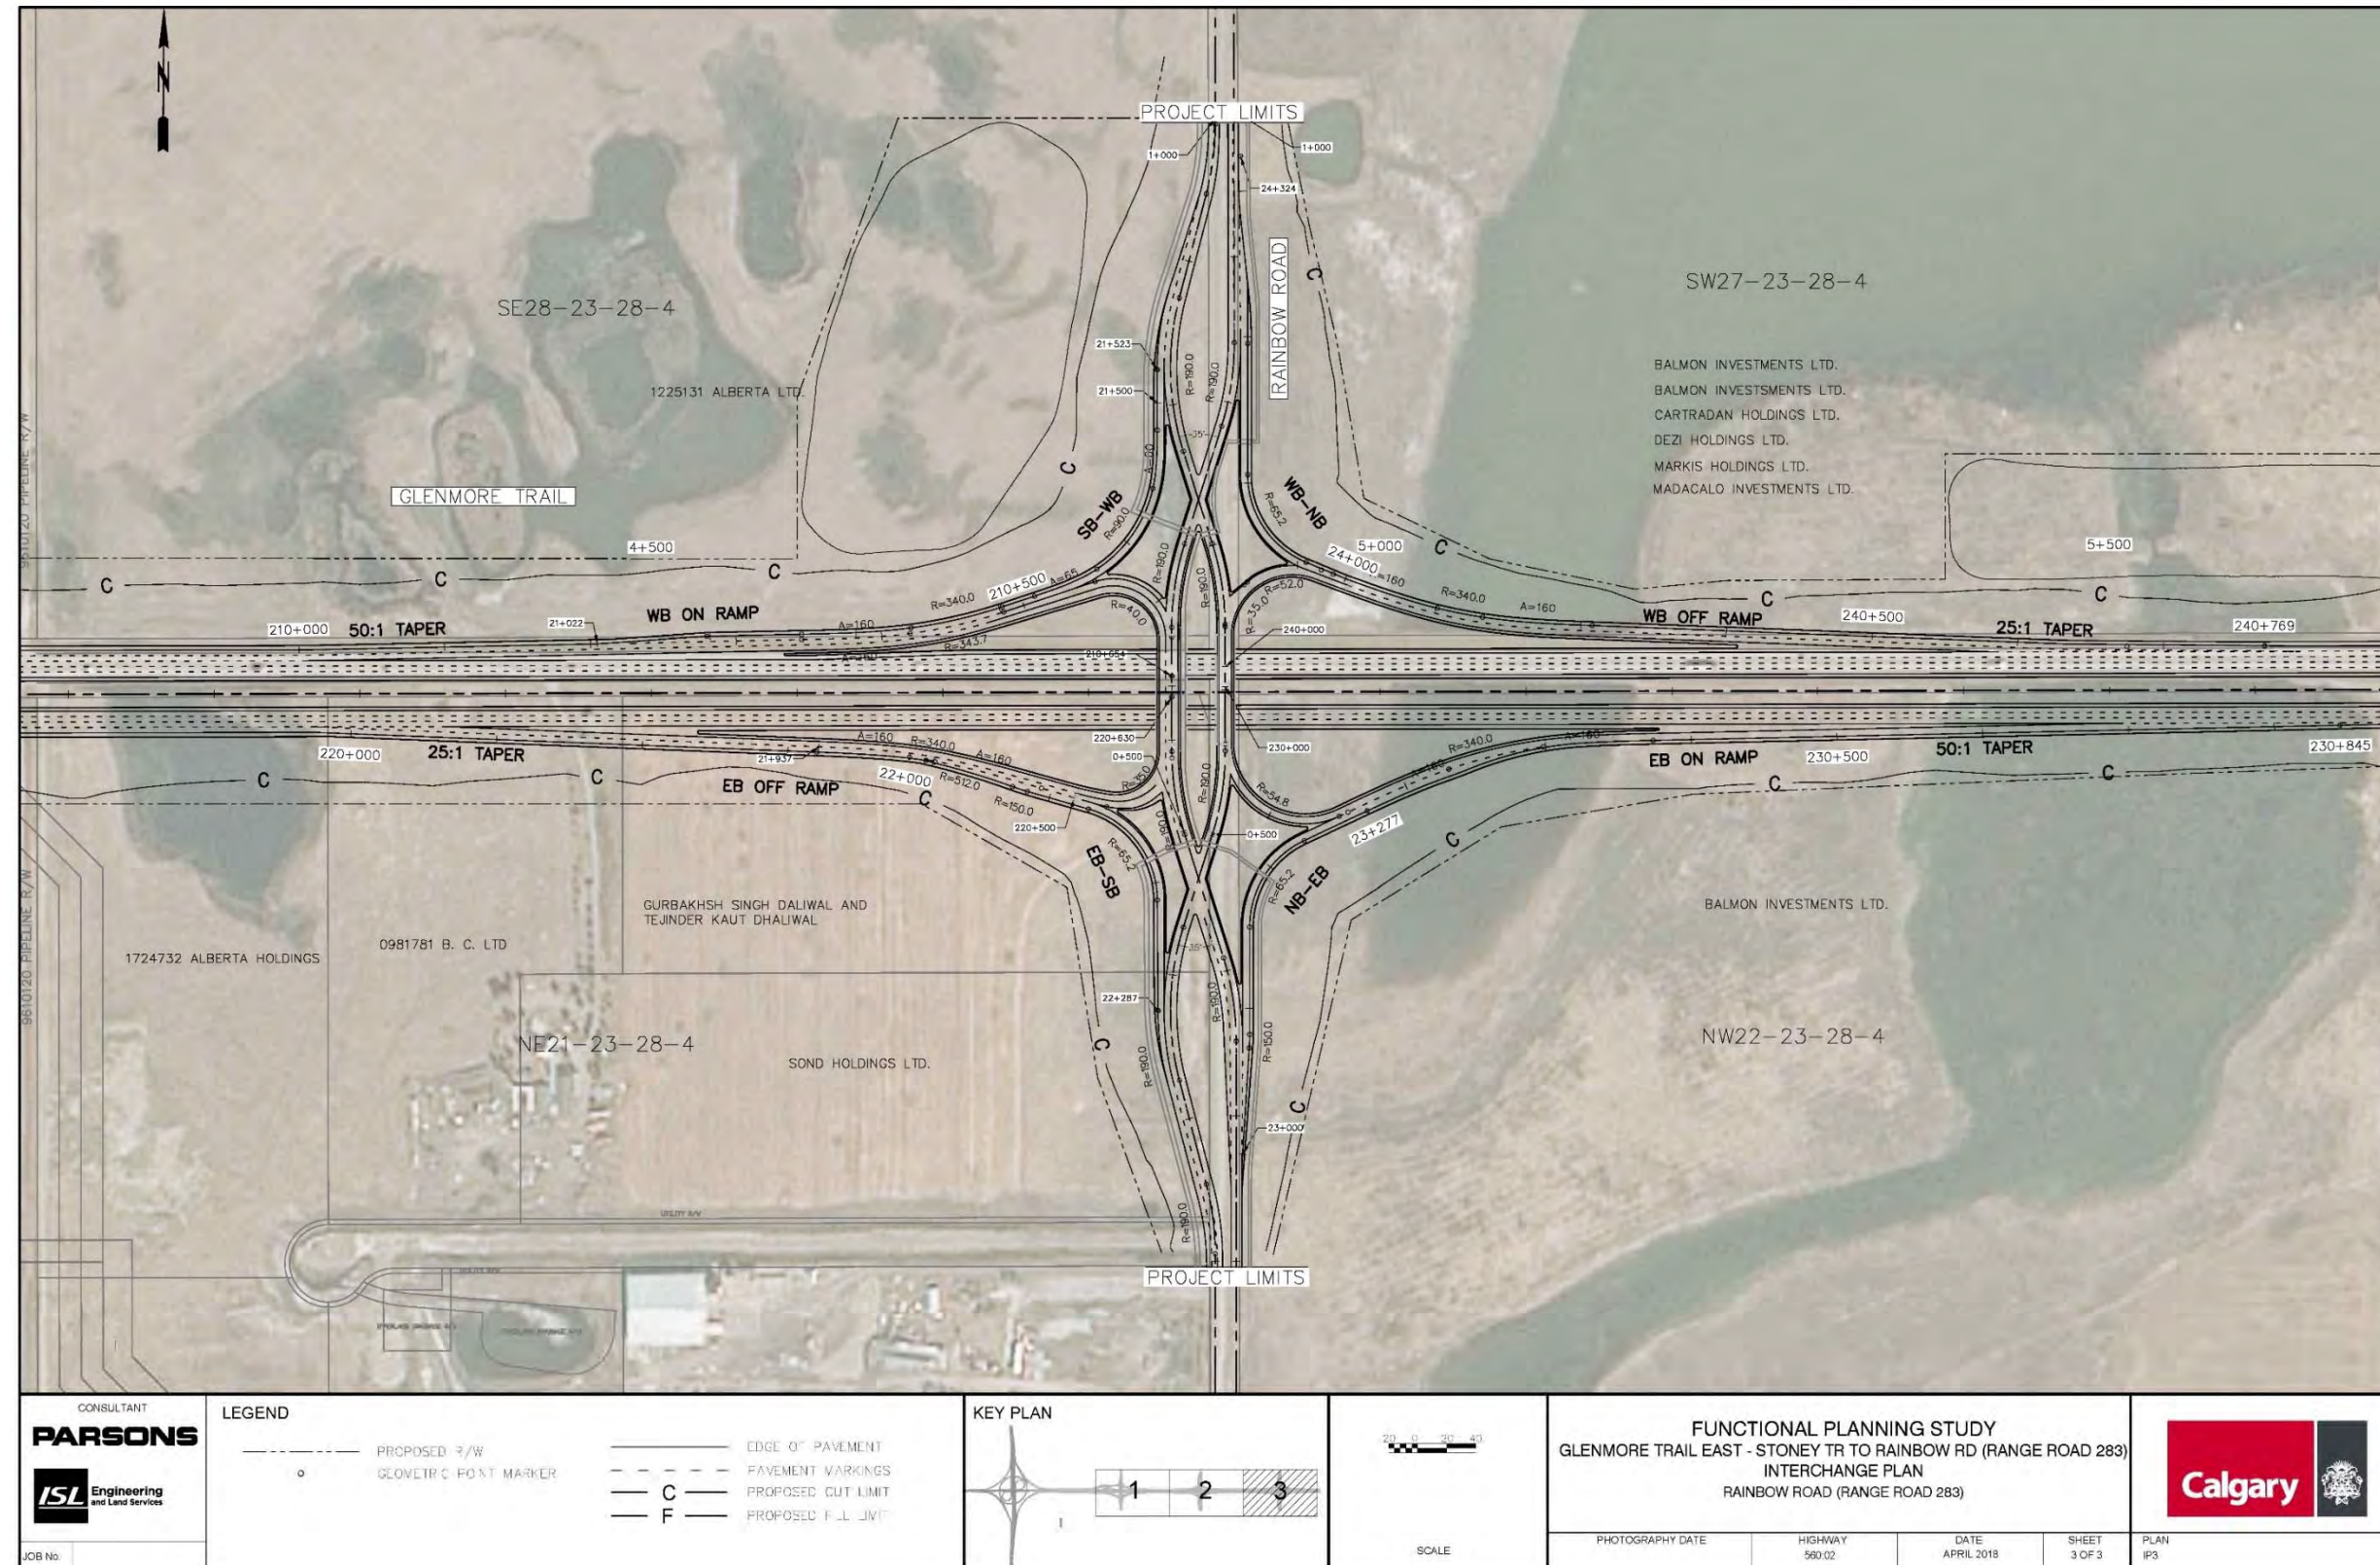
RECOMMENDED PLAN –RAINBOW ROAD
